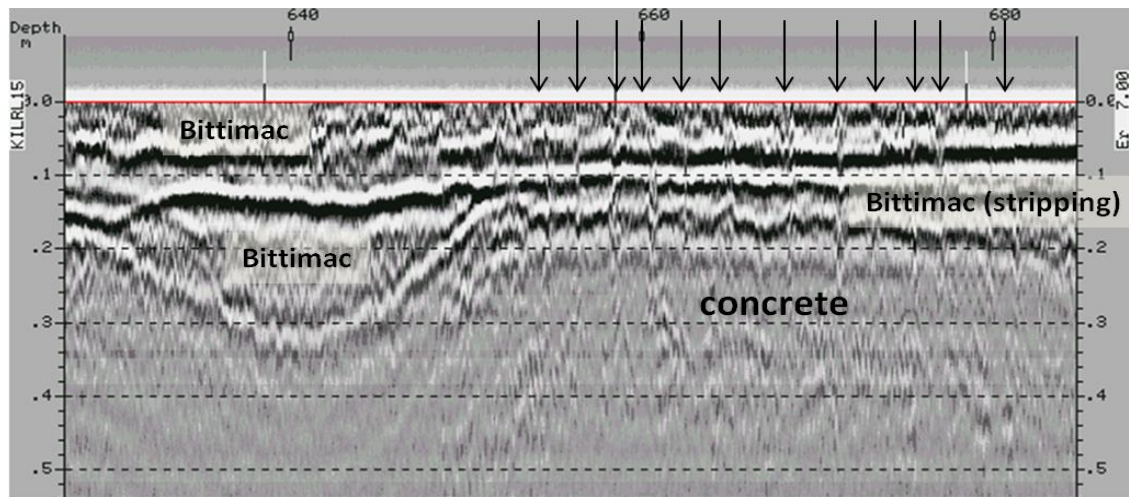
2 A 1.5 GHz GPR longitudinal profile over Killimster Moss. Transverse cracks going through the concrete slab and bitmac are shown with arrows. Stripping in the bitmac layers starts roughly at level of 0.1 m.
